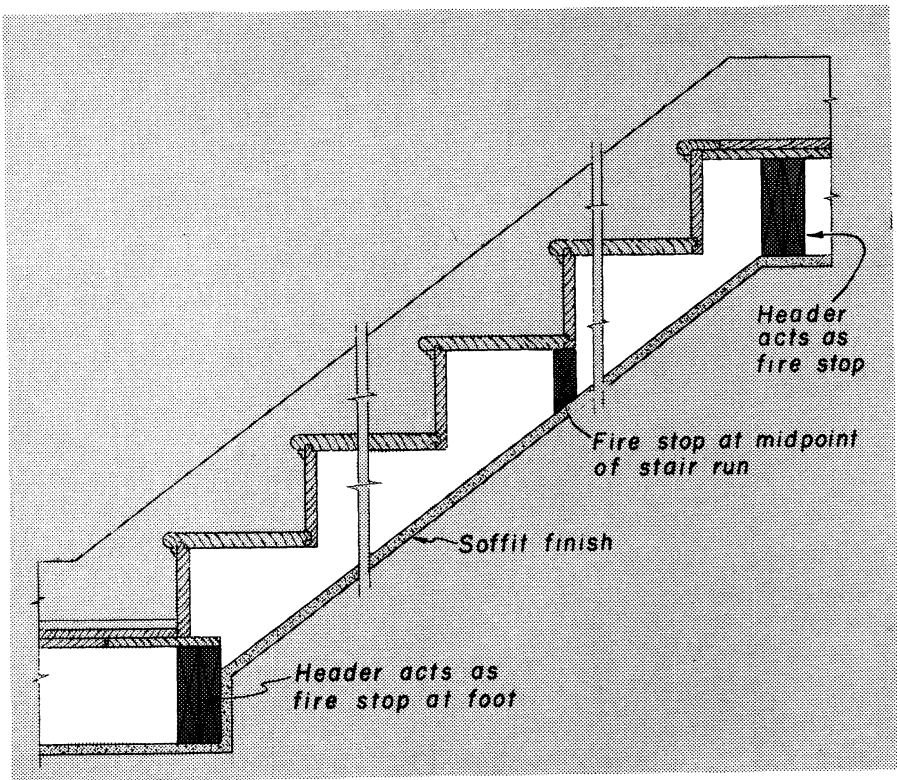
Firestopping at the top and bottom will prevent a stairway from acting as a flue to spread fire. A long stairway should also have a firestop midway in the stair run.
